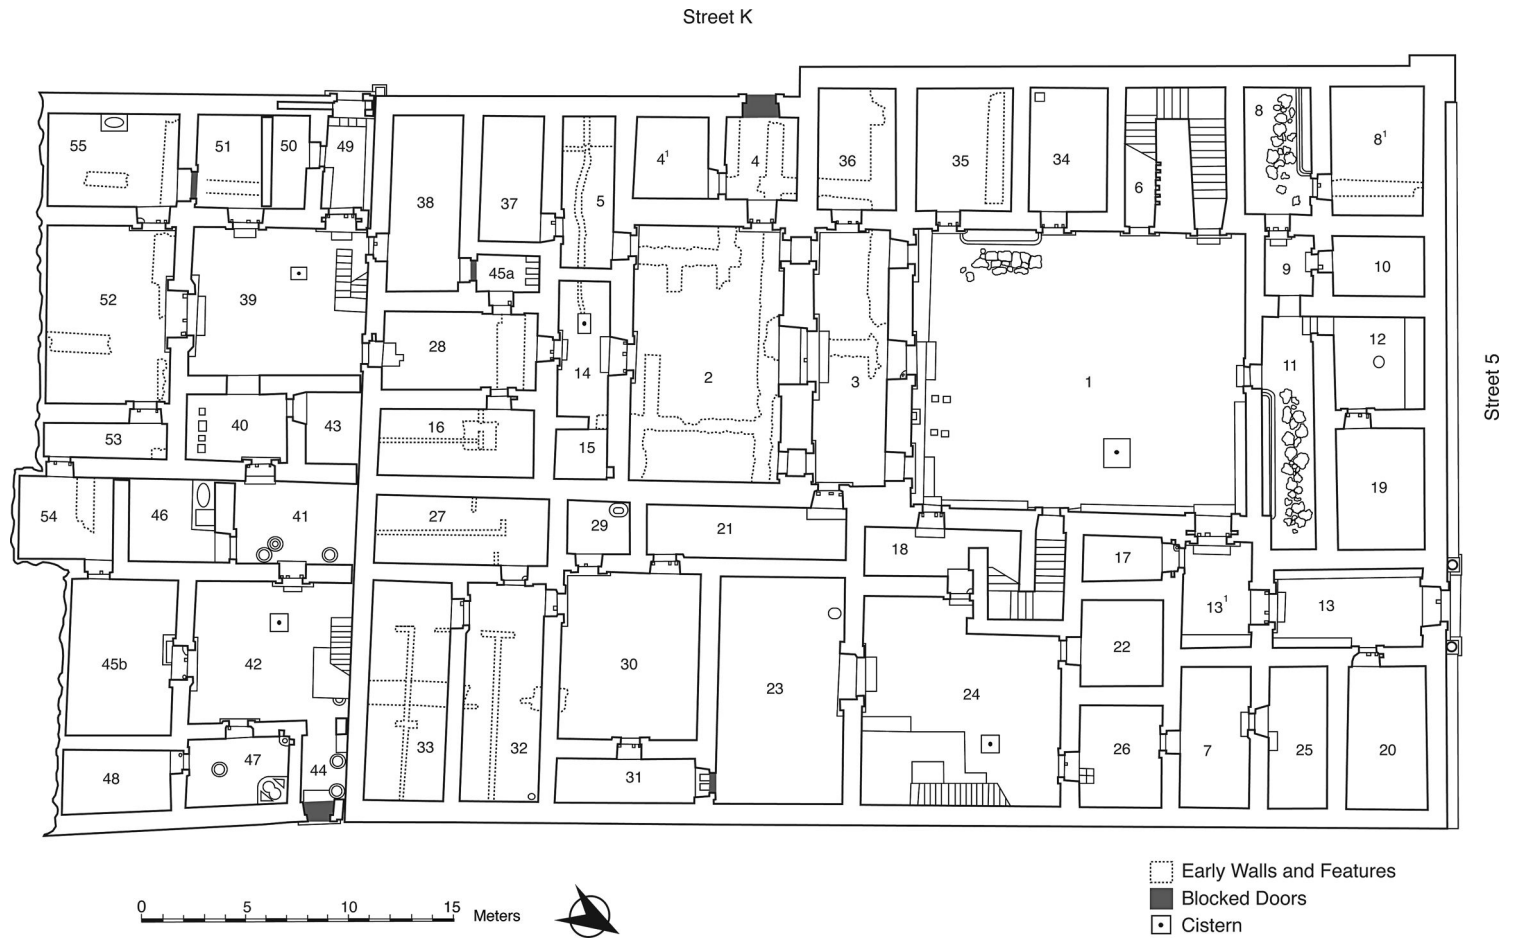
Block D1, the 'House of Lysias'. Plan by the author after plans by N. C. Andrews in the YUAG Archive.
